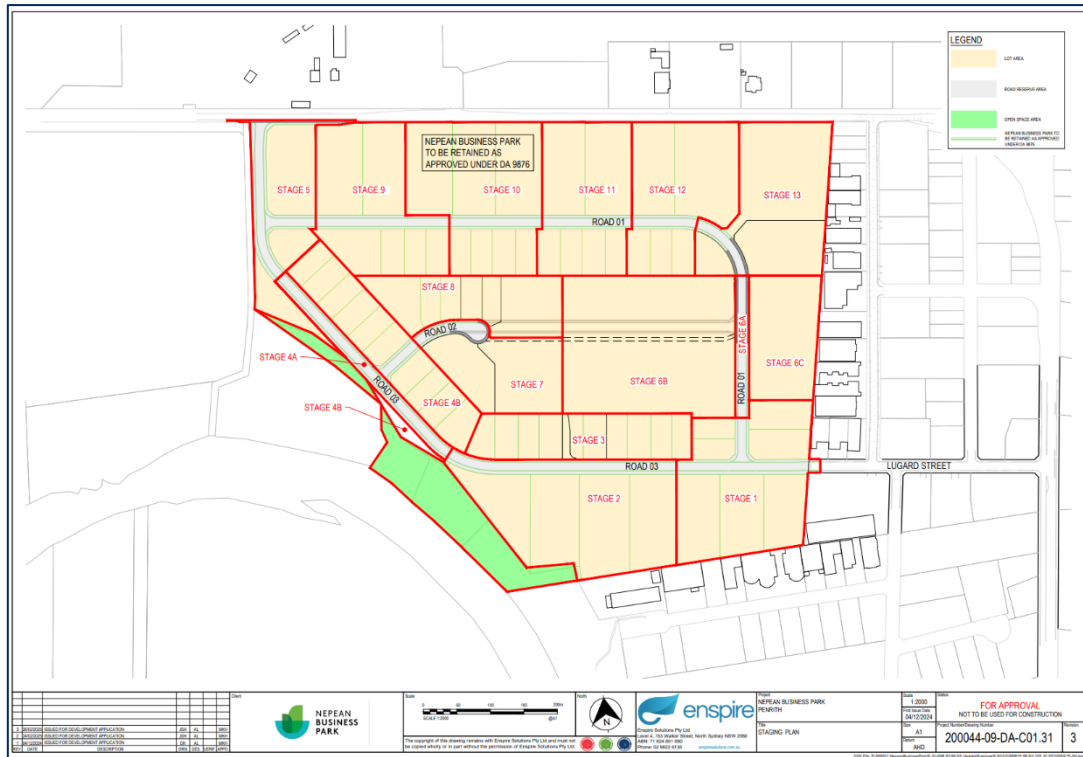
| Proposed staging plan (Source: SEE, 2025 (fig. 8))
